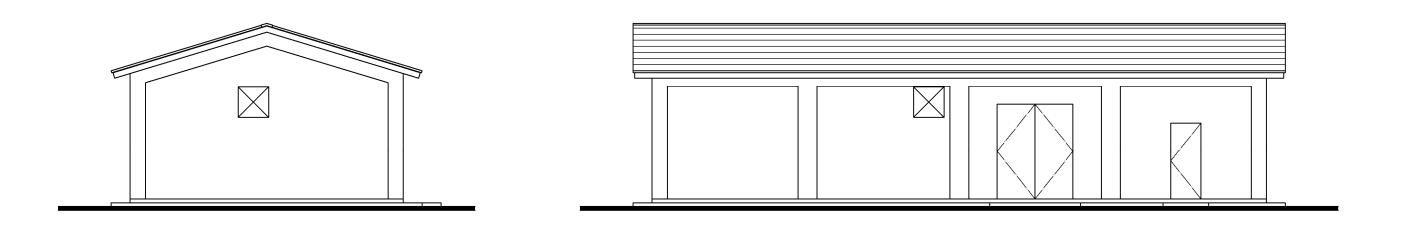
Mawagga and Kyeriba MW Transmitting Station Buildings / Plan and Sections
